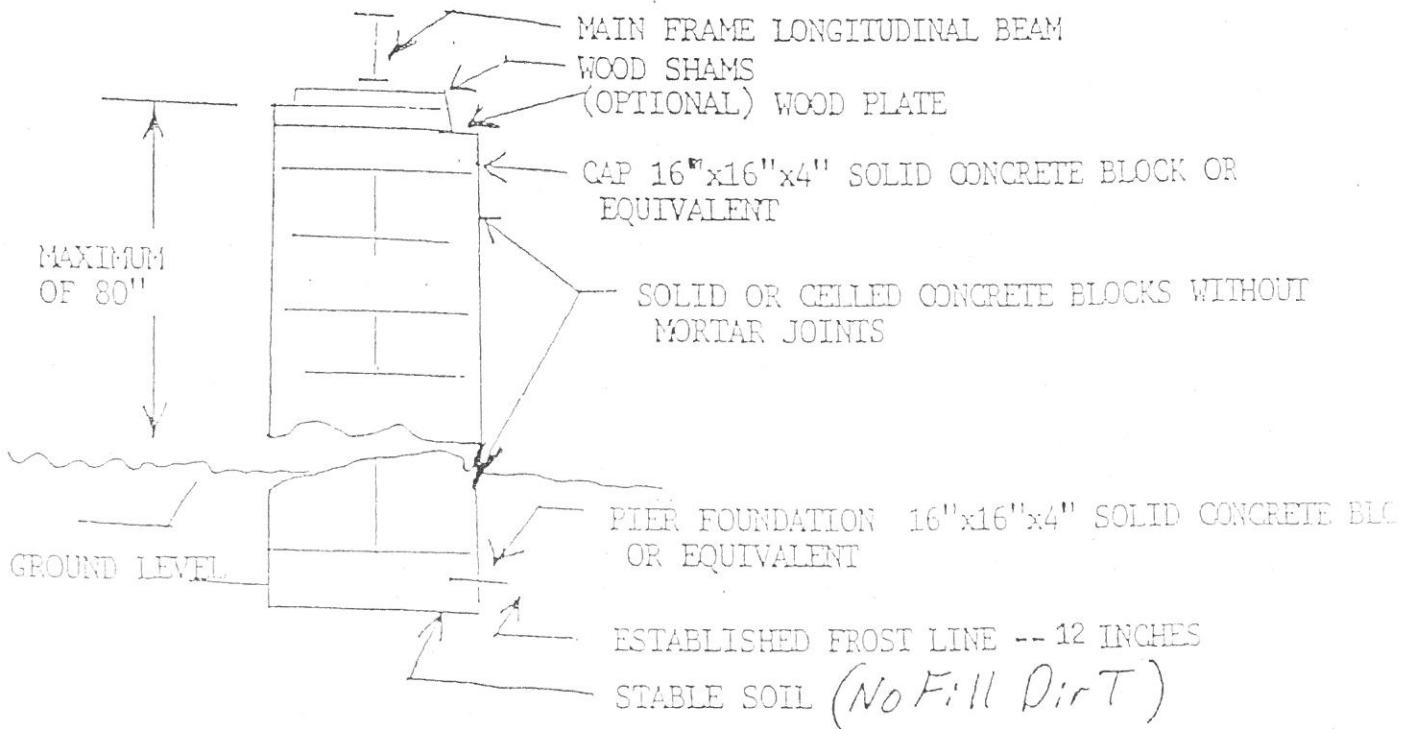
FIGURE II. PIERS OVER 40" IN HEIGHT AND NOT EXCEEDING 80" IN HEIGHT (DOUBLE BLOCK CONSTRUCTION).
